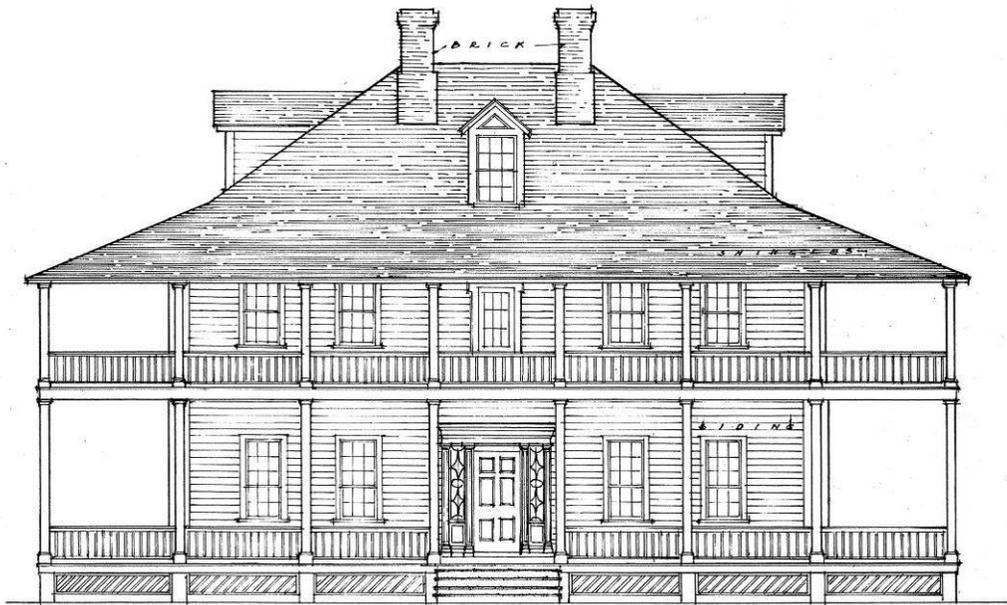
Hospital elevation, Vancouver Barracks, Washington, 1937 (Library of Congress, HABS WA-41-D).
